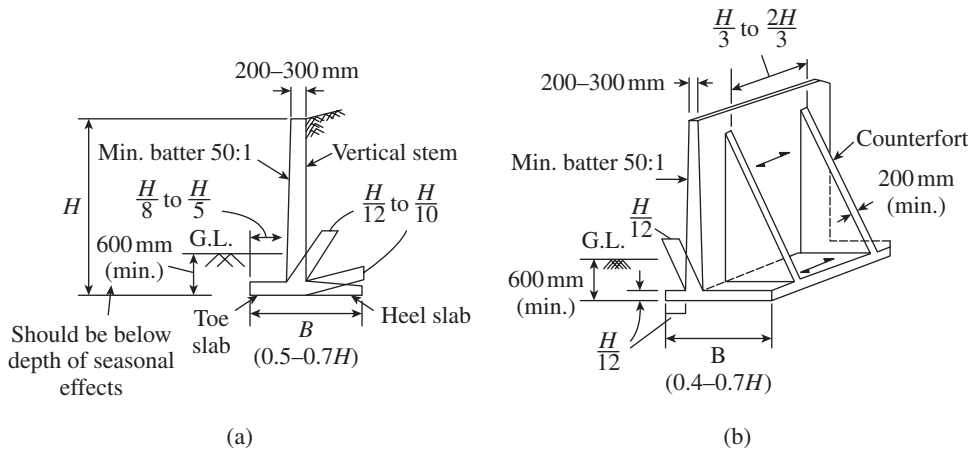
Common proportions of retaining walls (a) Cantilever-retaining wall (b) Counterfort-retaining wall
